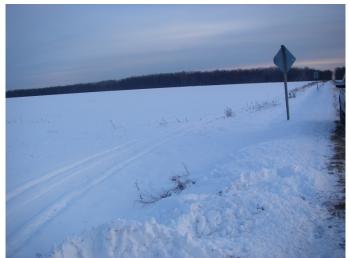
Lake-q (tile 12) - Looking at roadside ditch along South Cayuga Road at channel location. Site is located on South Cayuga Road, between Rainham Road and the lakeshore.
